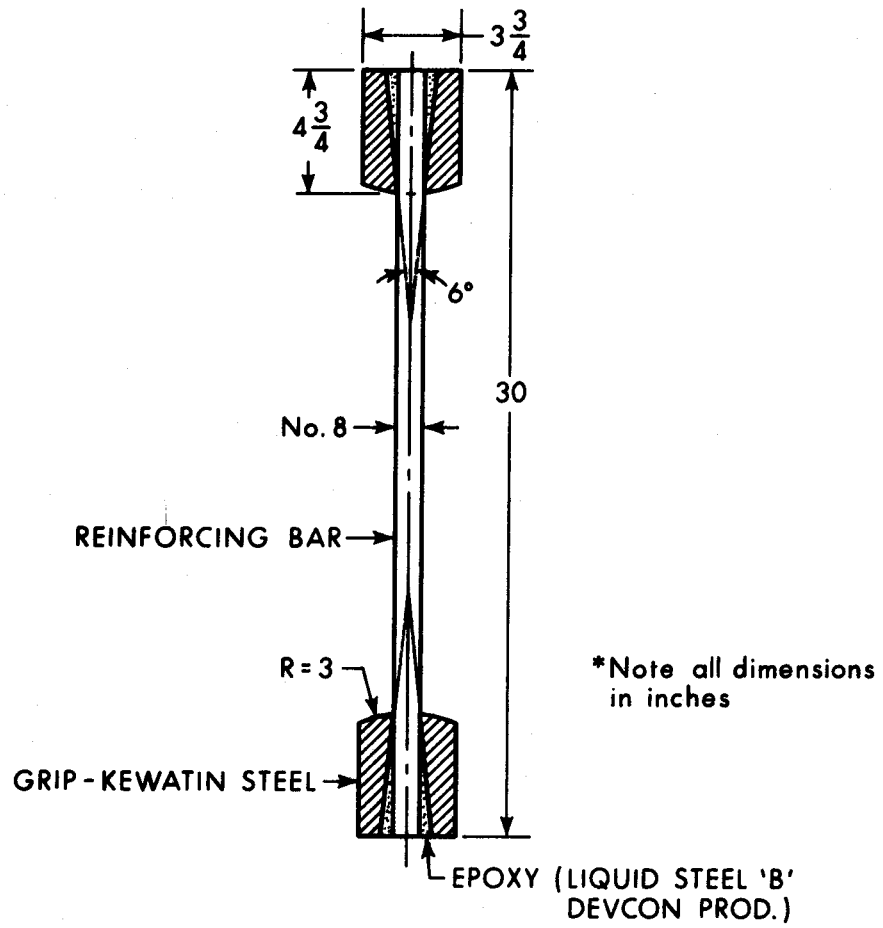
DETAILS OF FATIGUE SPECIMEN TESTED IN AIR
